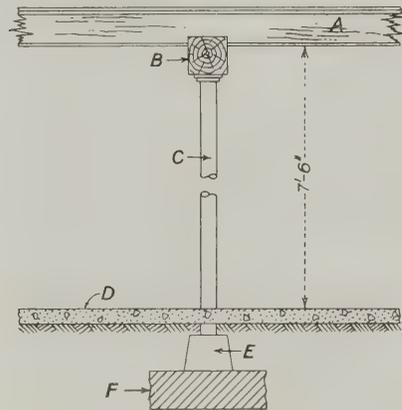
Elevation of Pipe Column—Scale 1/4 In. to the Foot
